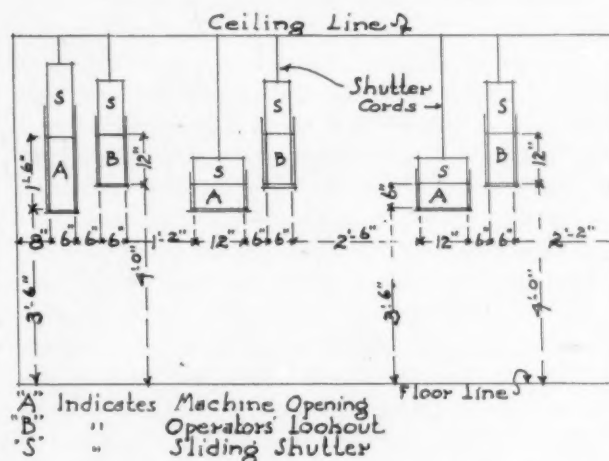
Inside Elevation of Wall in Motion Picture Booth toward Auditorium
